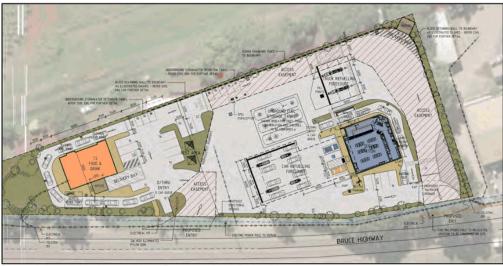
Overall Site Layout (Verve Drawing: 19115-DA01\_P9)
